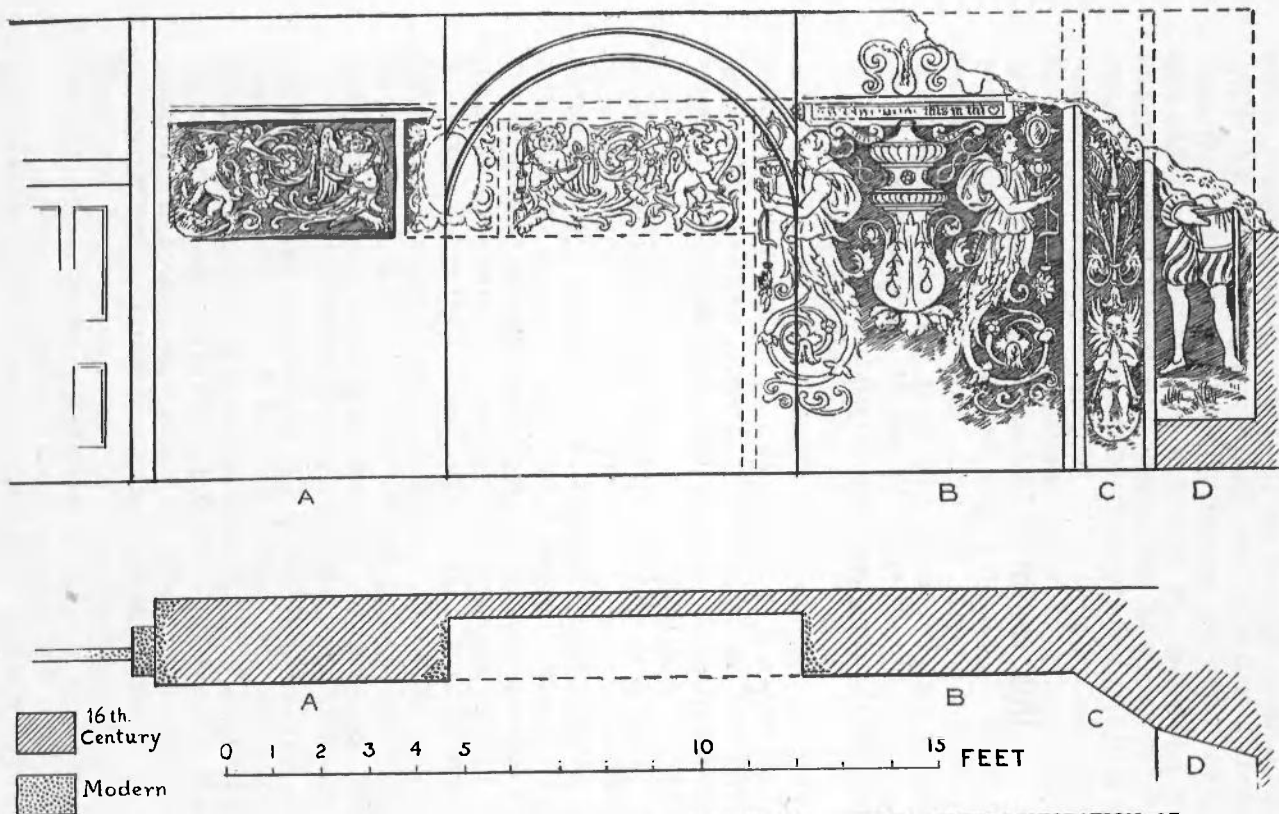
PLAN AND ELEVATION OF PAINTED WALL, MILDENHALL, SUFFOLK, WITH RESTORATION OF DECORATIVE SCHEME
